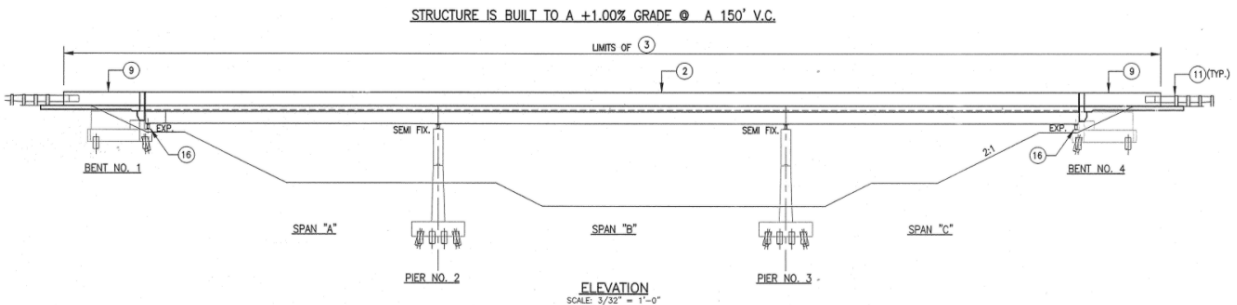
Elevation View of the Bridge (NBI 13000) (2002)
